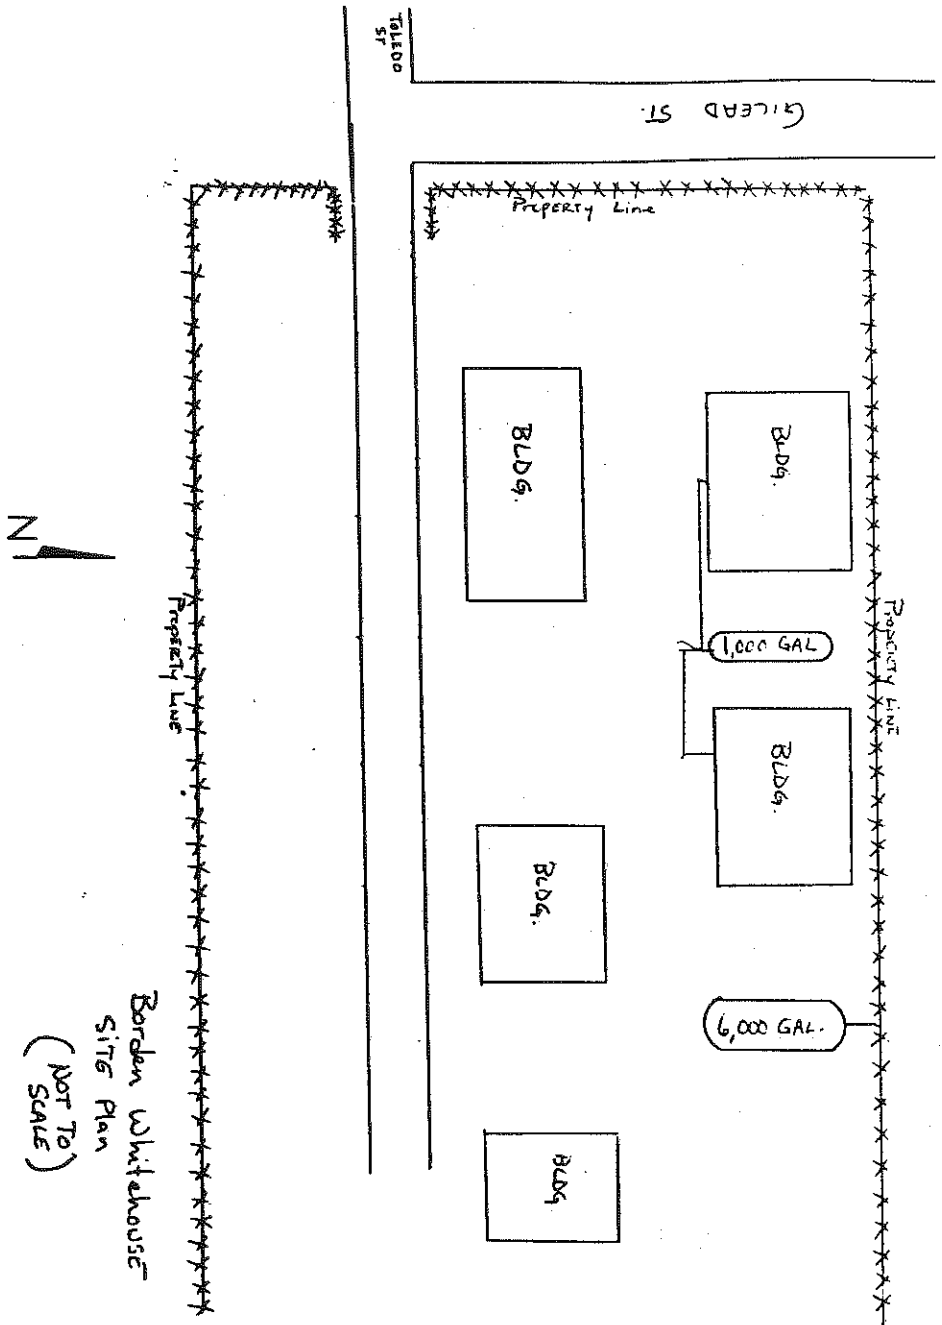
Site Configuration: Borden Graphics Facility, Whitehouse, Ohio.
